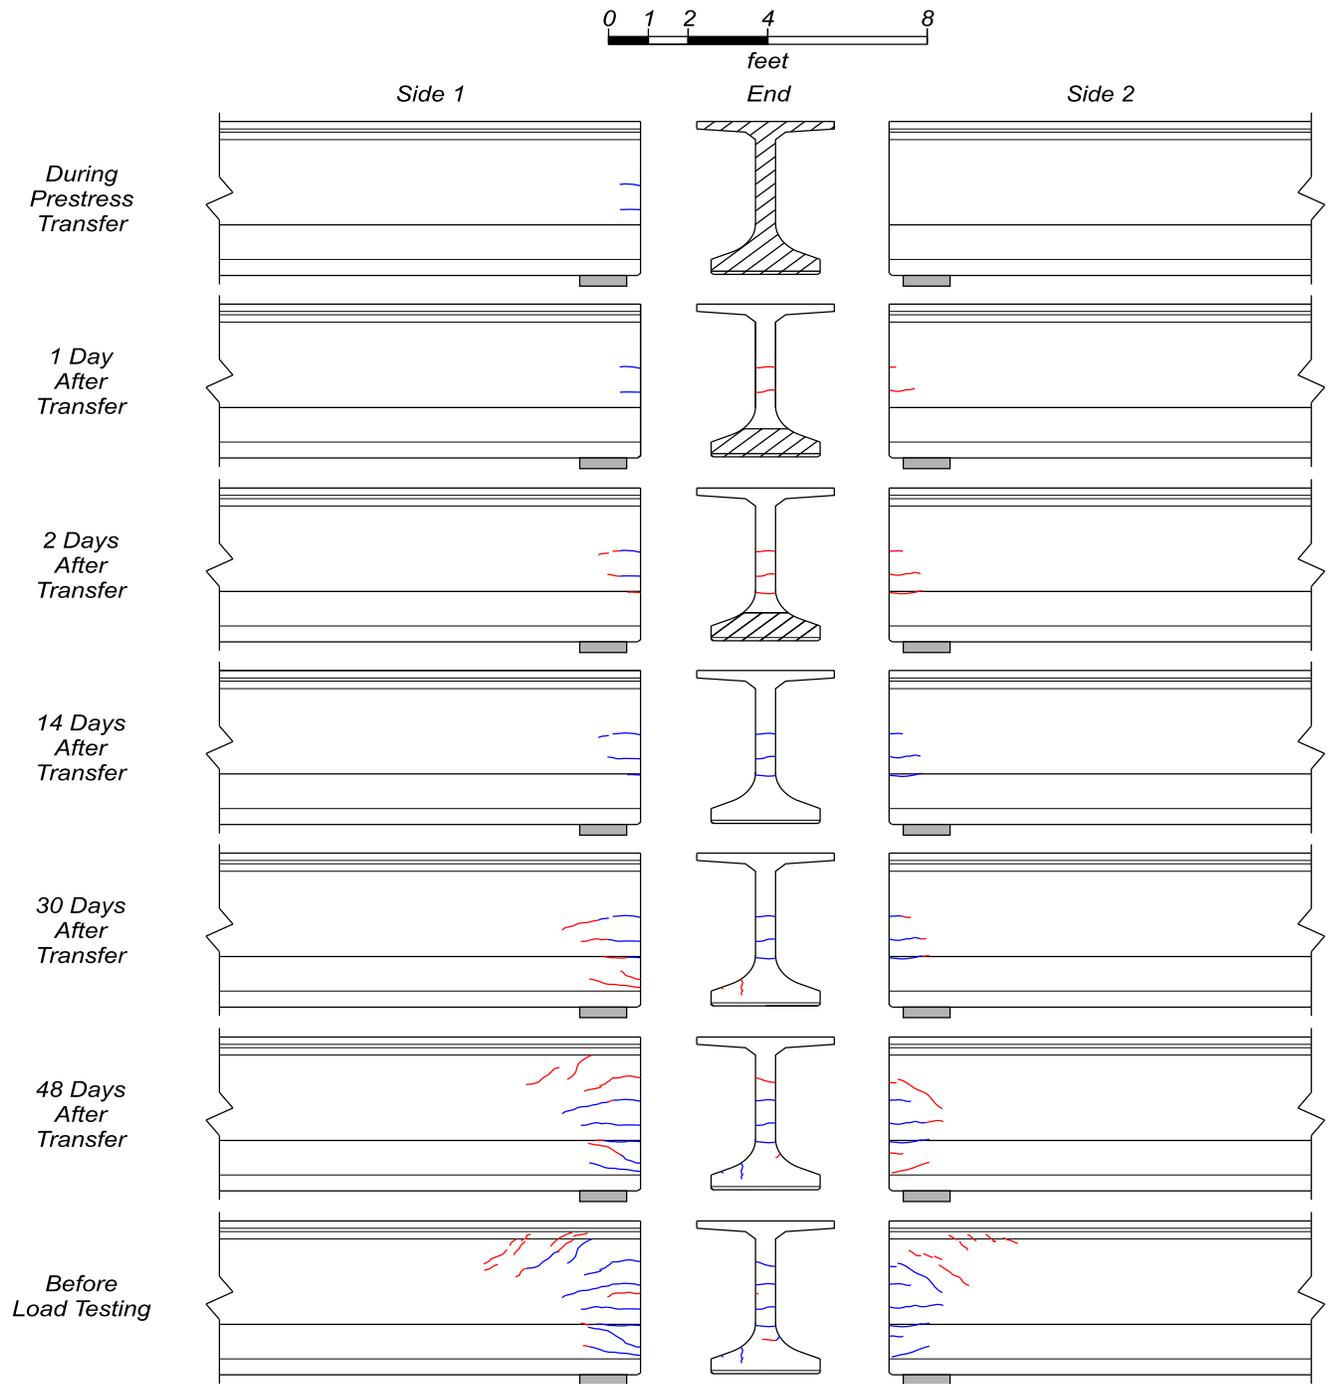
Crack growth in specimen SL (flexural cracks in top flange not shown)
